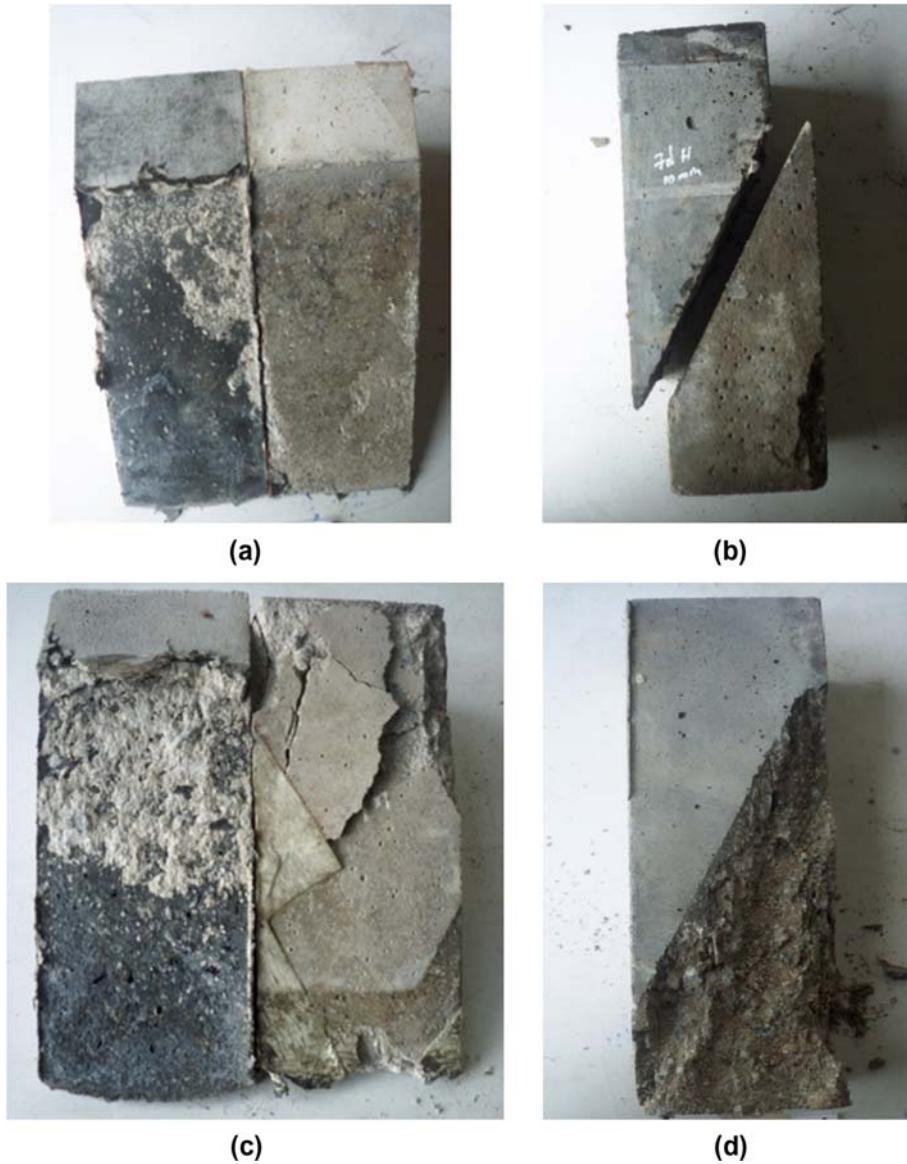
The failure modes of the slant shear test: (a) Type A failure, (b) Type B failure, (c) Type C failure, and (d) Type D failure.
